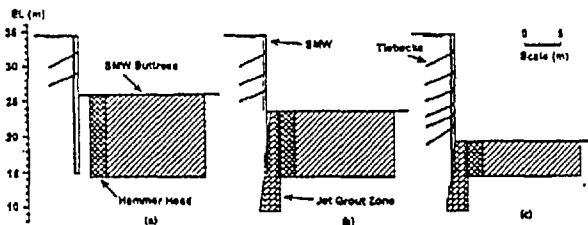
Construction Sequence for Base Stabilization Scheme: (a) Construction of SMW Buttress; (b) Jet Grouting; (c) Final Sub-grade
